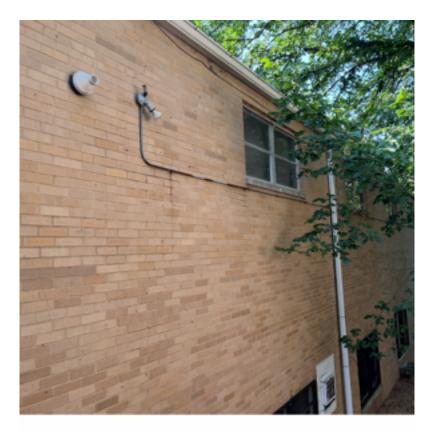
East side of gym building elevation showing 2 of 10 clerestory windows with 8 others obscured.
